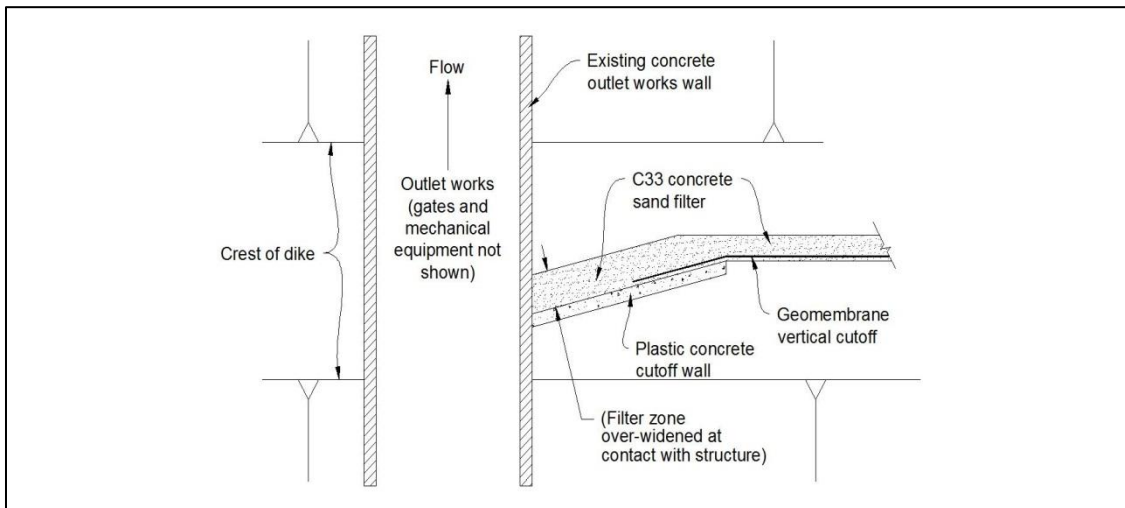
Connection detail for vertical geomembrane cutoff wall with outlet works structures at Reach 11 Dikes, Arizona.
